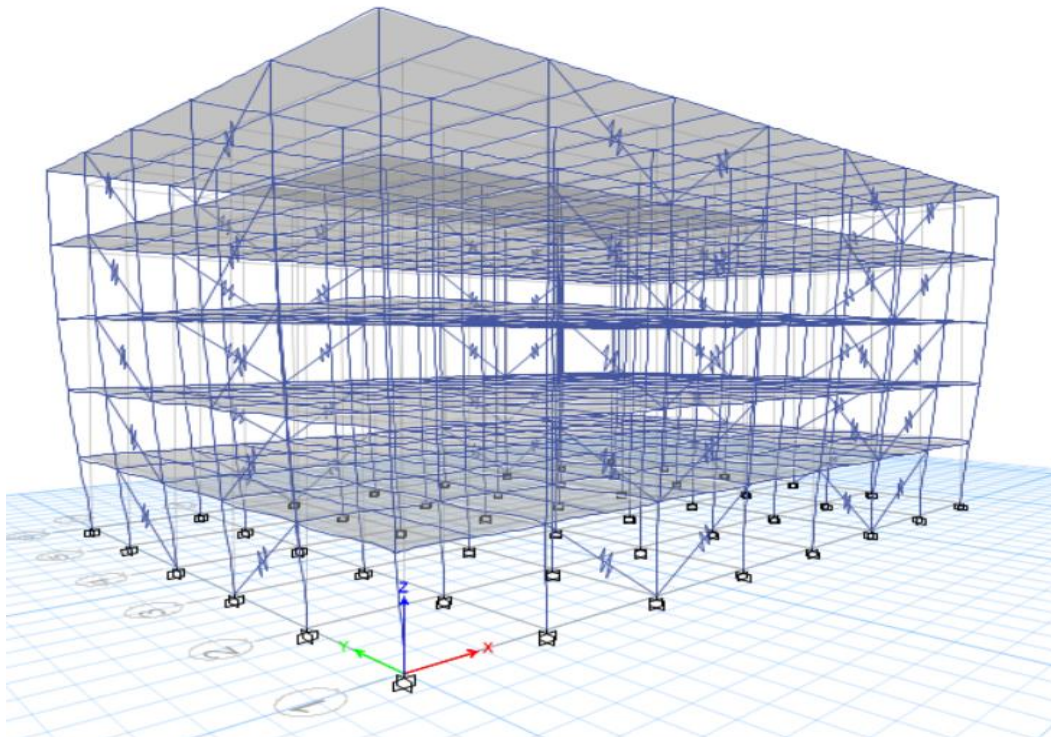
immediate occupancy stage of plastic hinges of FD.L1 5-story steel building
